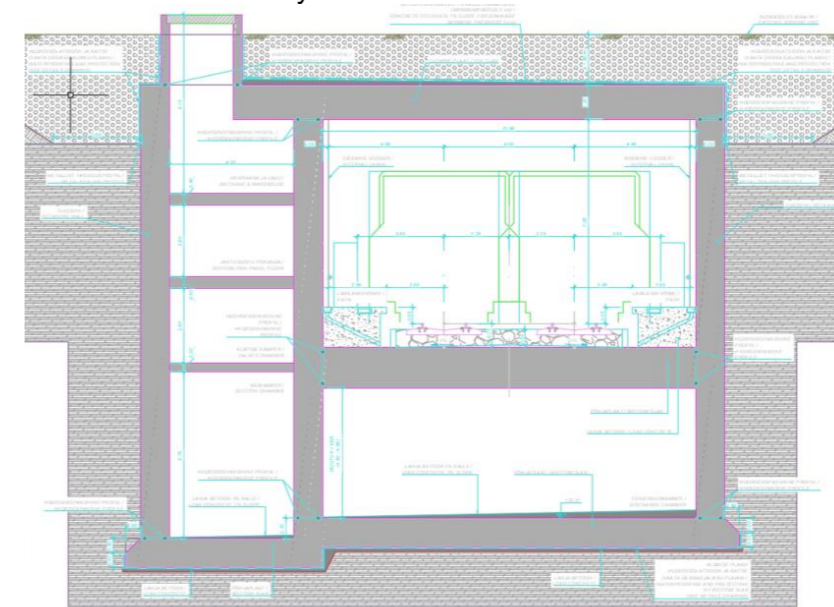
Water tank section of BR0060 tunnel showing drainage elements
